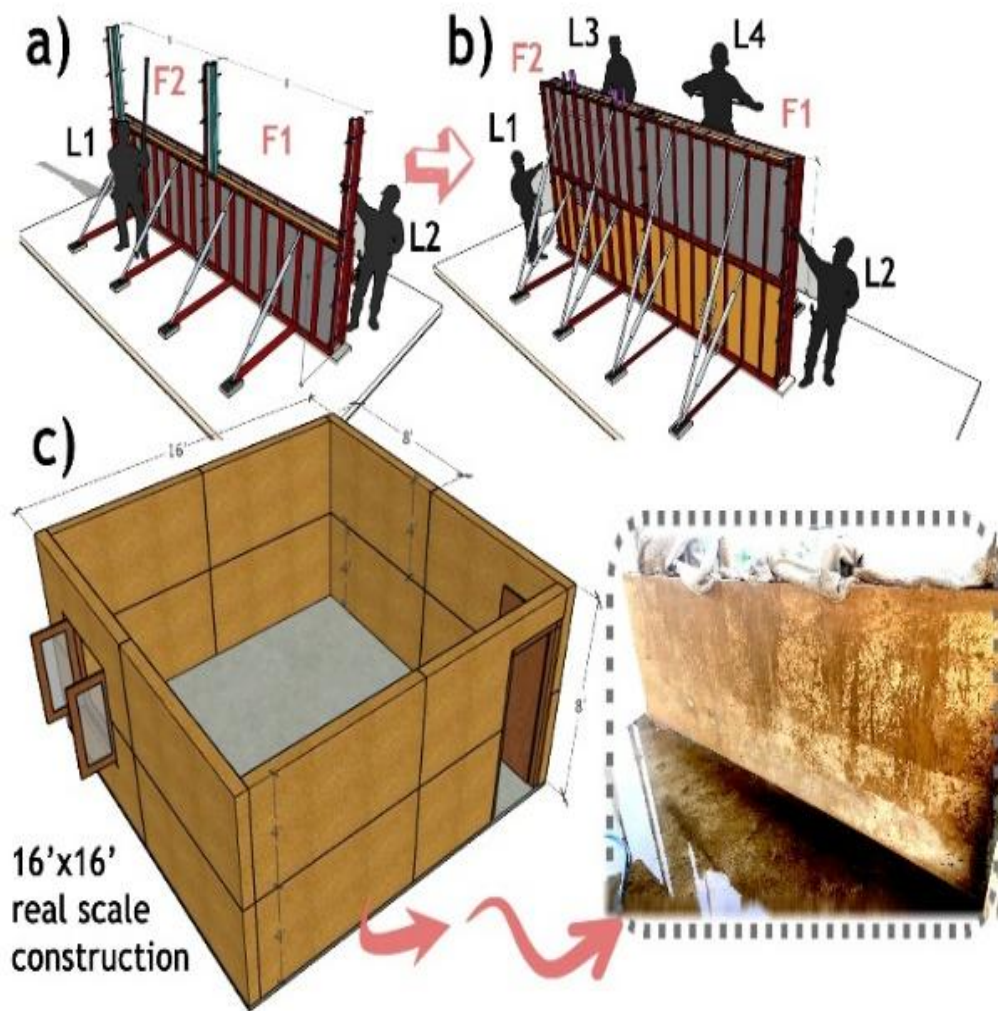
a)-Step one; Formwork (F) assembling for 16'-0" length and 4'-0" height. b) - Step two; bottom formwork dissembling and assembling the top formwork. 02 nos. of labour (L) required for formwork assembling and 02 labour (L) was required for mixing and pouring the MC mix.
